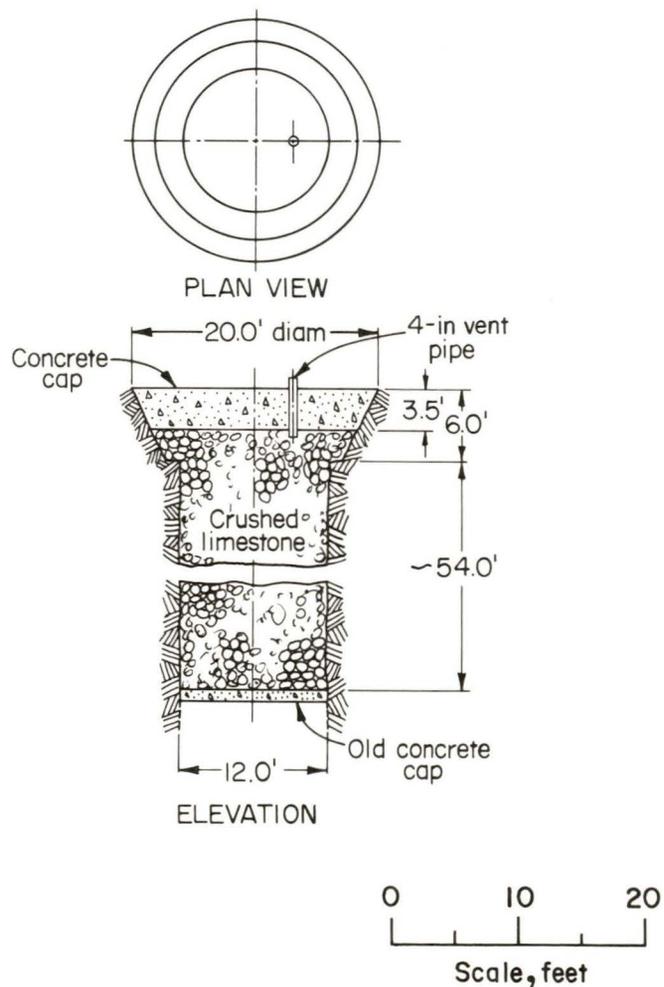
Plan view and elevation of sealed opening at Ohio Collieries No. 268 Mine, shaft 1.
